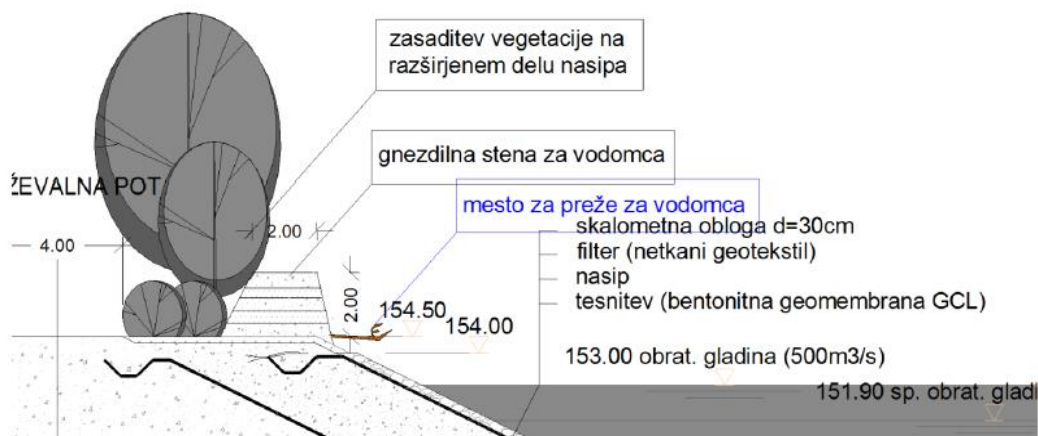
Kingfisher's breeding wall construction plan<sup>44</sup>
